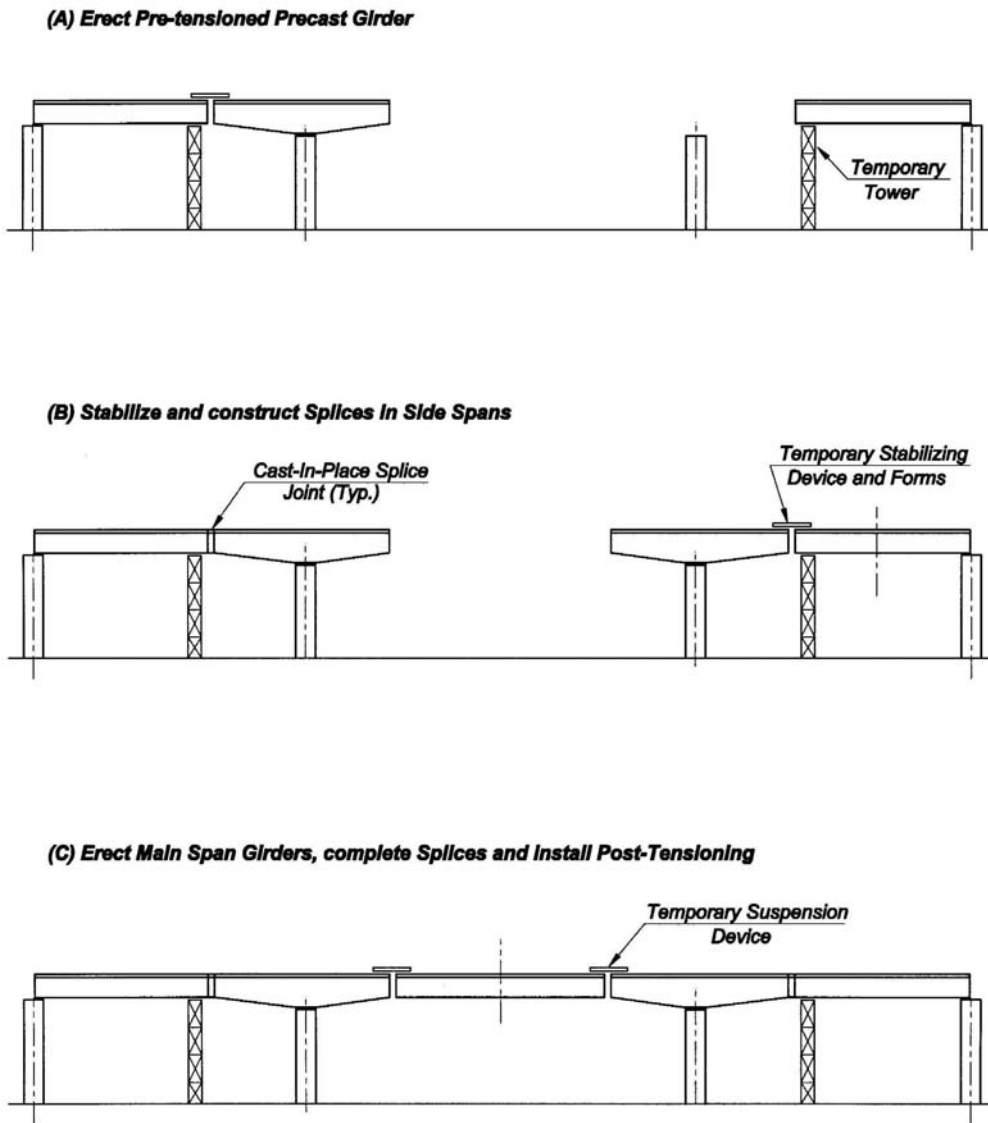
Erection of Precast Girders for 3-Span Unit
